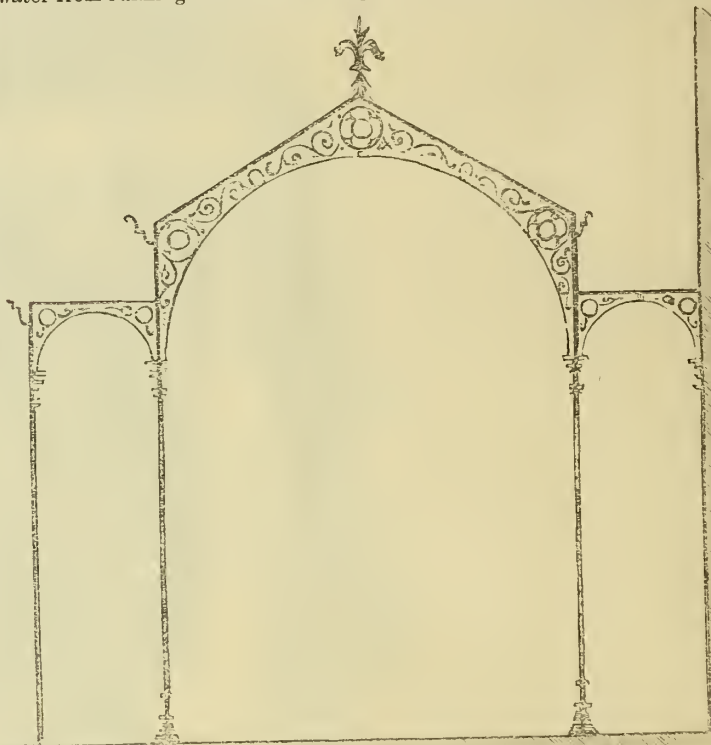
ORNAMENTAL SPAN CONSERVATORY AGAINST DWELLING HOUSE.
